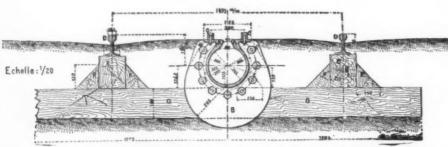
EXTERNAL VIEW OF THE PNEUMATIC TUBE
